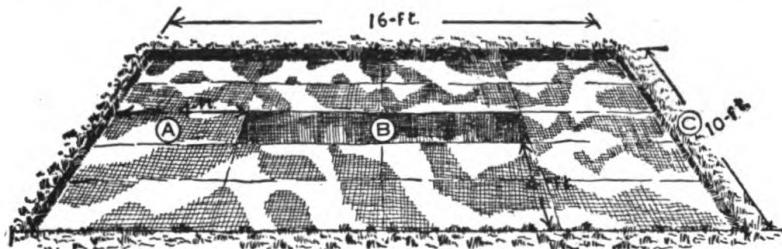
Flyproofing latrine pit. A—Oil-soaked burlap extending completely around pit. B—Opening of pit. C—Sidewall of excavation in which burlap is placed.
